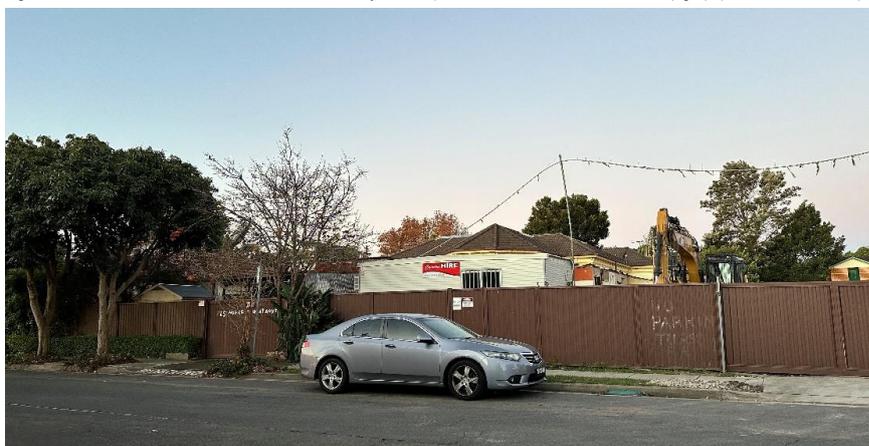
The site of 6 Rowley Street adjacent to the house at 2 Gordon Street, viewed east from Gordon Street.
